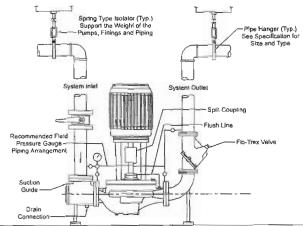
Alternative Arrangement to Reduce Footprint
